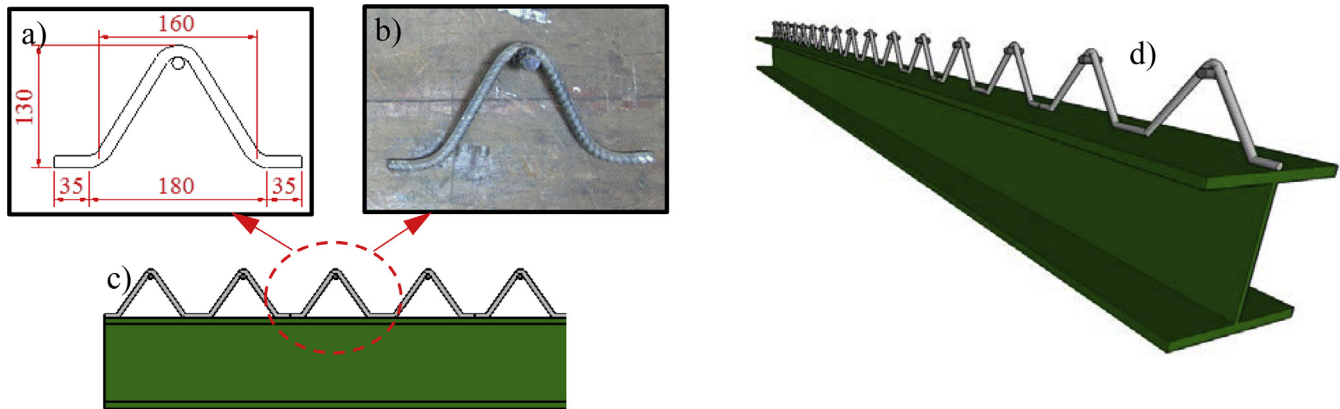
TT connector details: (a) Measures, (b) Triangle unit, (c) Frontal view, (d) Perspective view.
